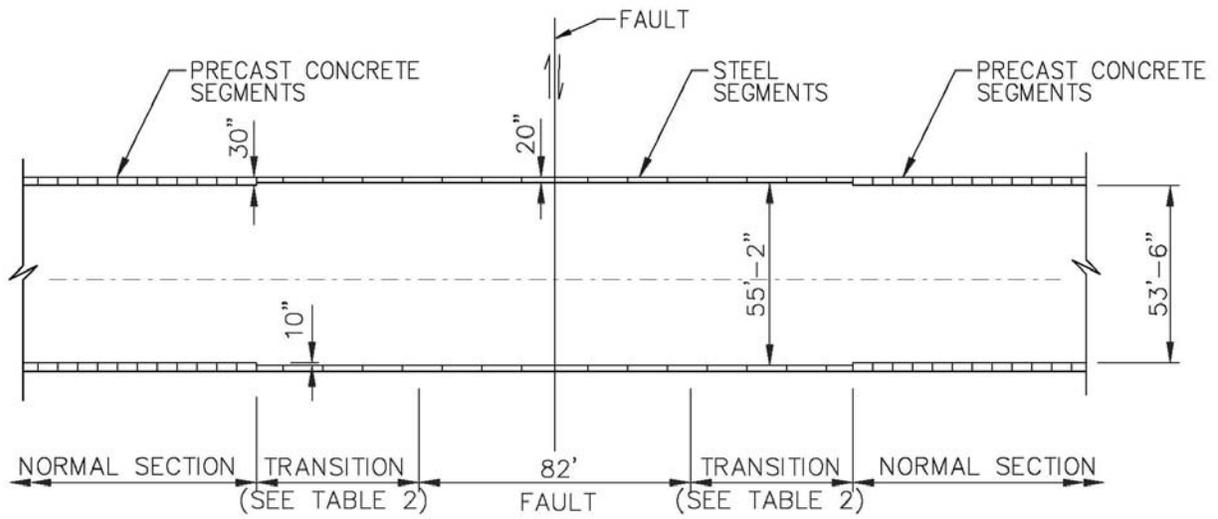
Vault Section at Raymond Fault Zone for Freeway Tunnel Alternative
